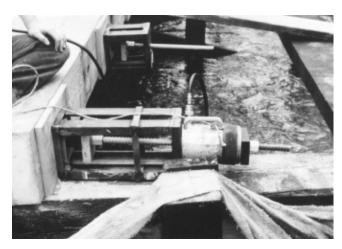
Initial tensioning of the stressing bars was completed with a hollow-core hydraulic cylinder and pump at each successive bar, beginning at one end of the bridge.
